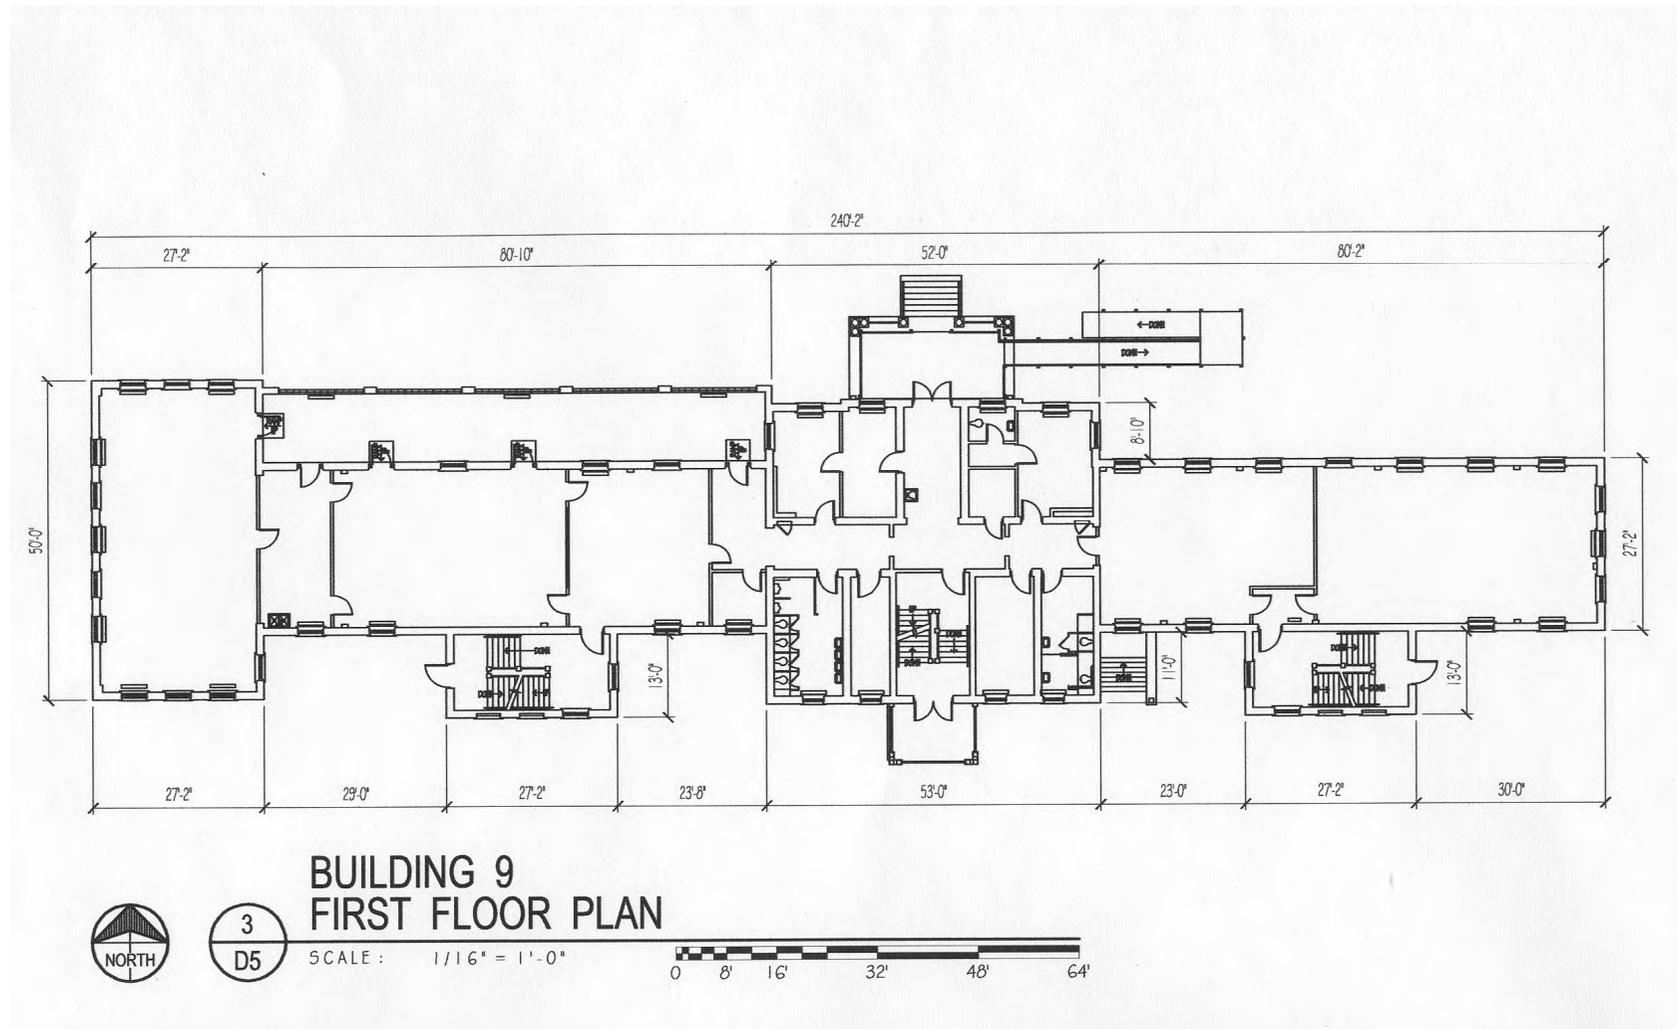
First floor plan of Building 9, showing existing conditions (Walton and Associates 2003).
